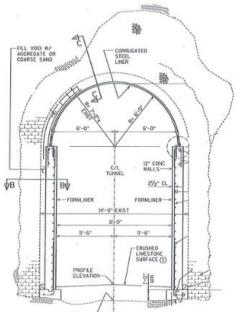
Existing cast-in-place tunnel repair constructed in 2005.
